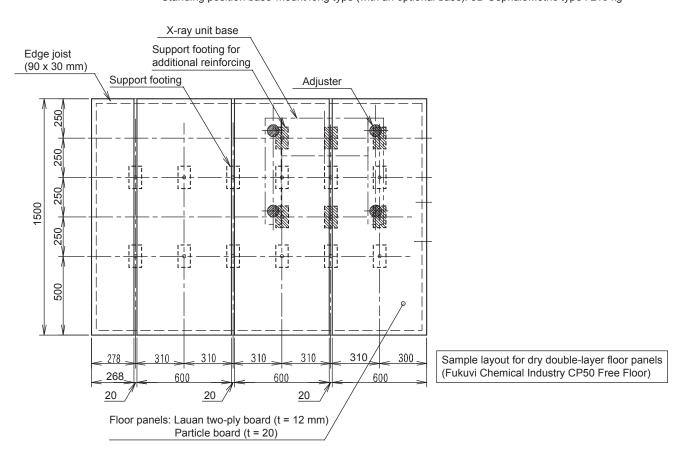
Sample layout for dry double-layer floor panels (base-mounted)
